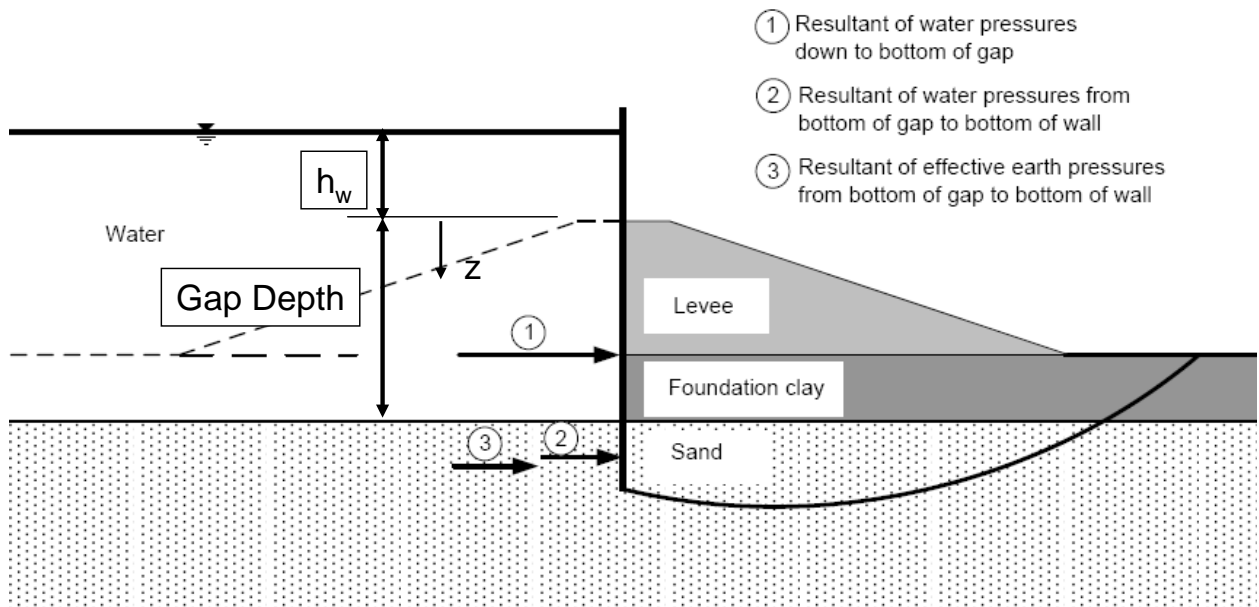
Situation for I-wall penetrating sand layer showing gap depth and resultant forces acting on sheet-pile wall
